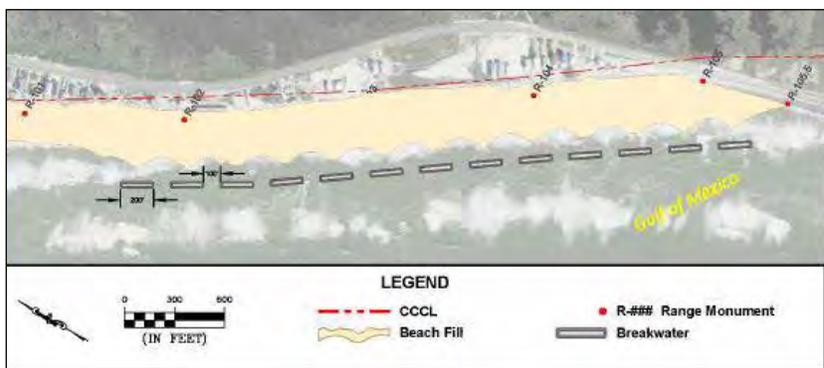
C. Proposed Breakwater Alignment Plan View (MRD Assoc, 2017).
